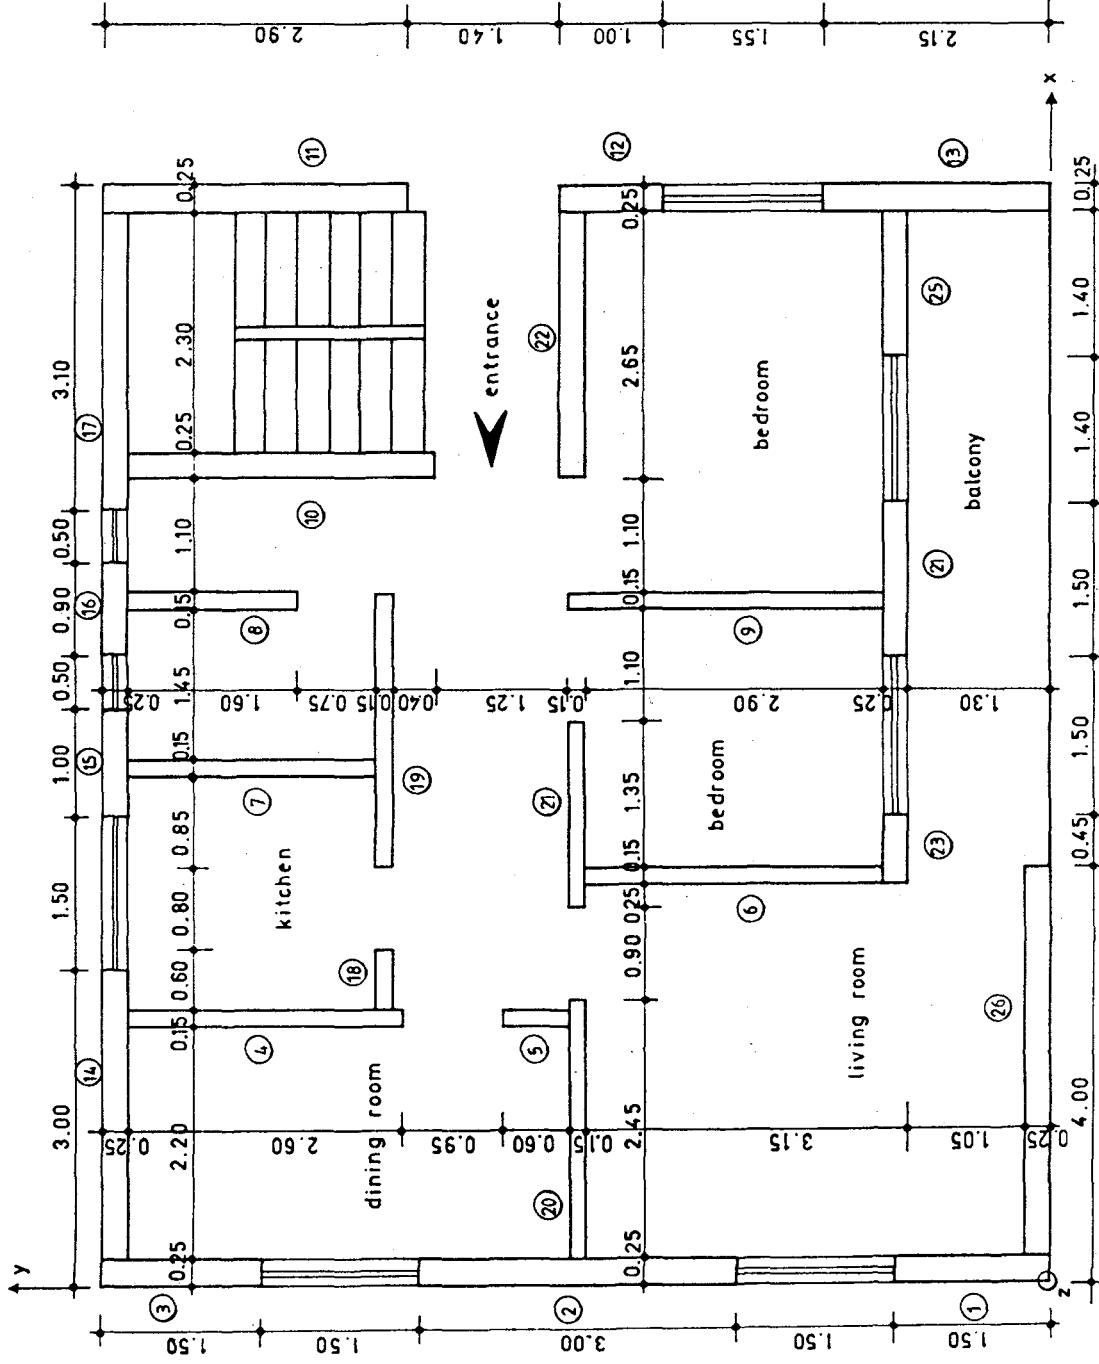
Plan view of the 3-story brick masonry building (Structure 2)
